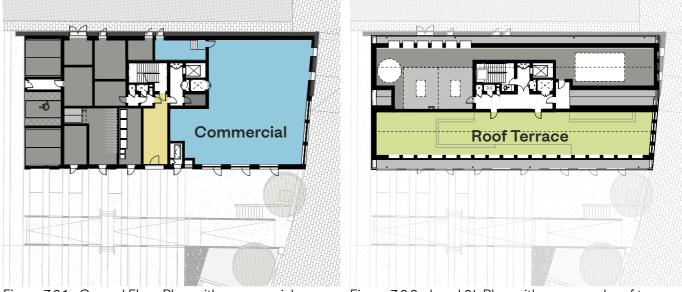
Ground Floor Plan, with commercial space Figure 7.6.2 - Level 04 Plan, with communal roof terrace
